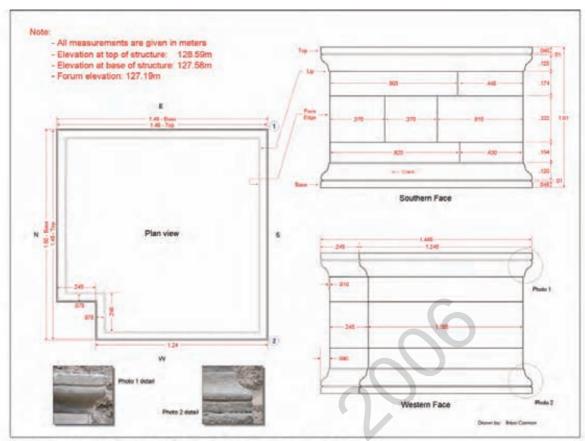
, Hippos 2006, the Roman podium: plan and elevations.
